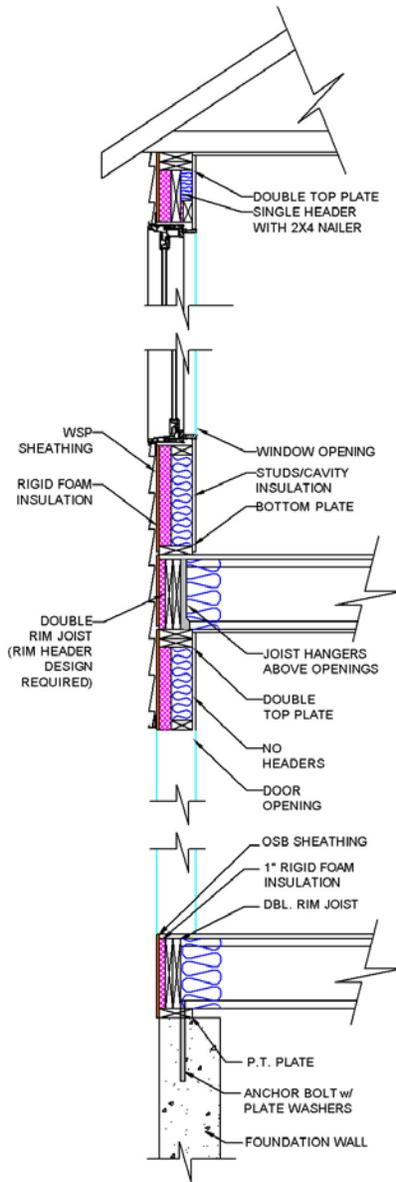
Extended Plate Wall (EPW) System, section view
